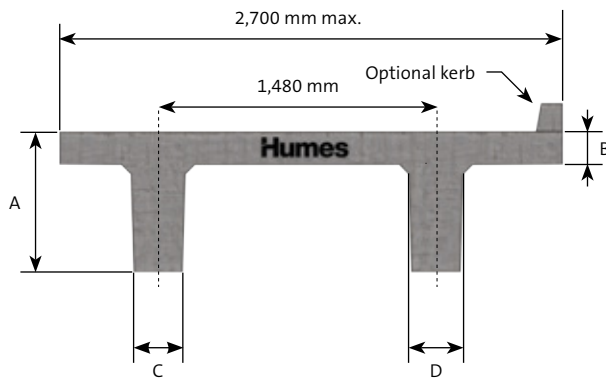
Cross-section detail of a complete HumeDeck® bridge system
